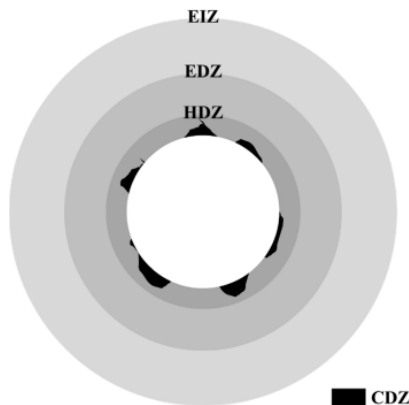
Excavation damage zones (EIZ, EDZ, HDZ) and construction damage zone
